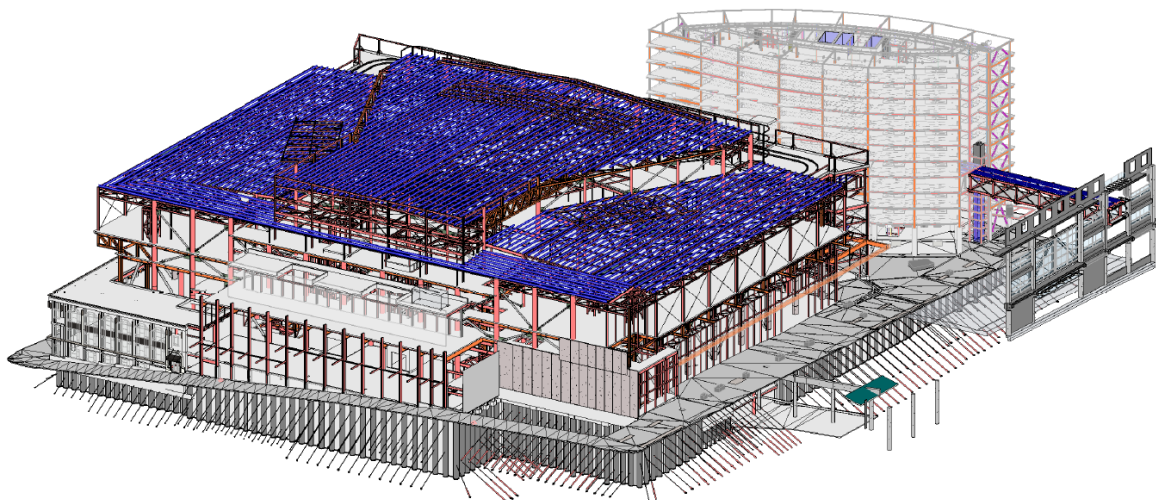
3D perspective of NZICC Structure, viewed from the south-eastern corner.
